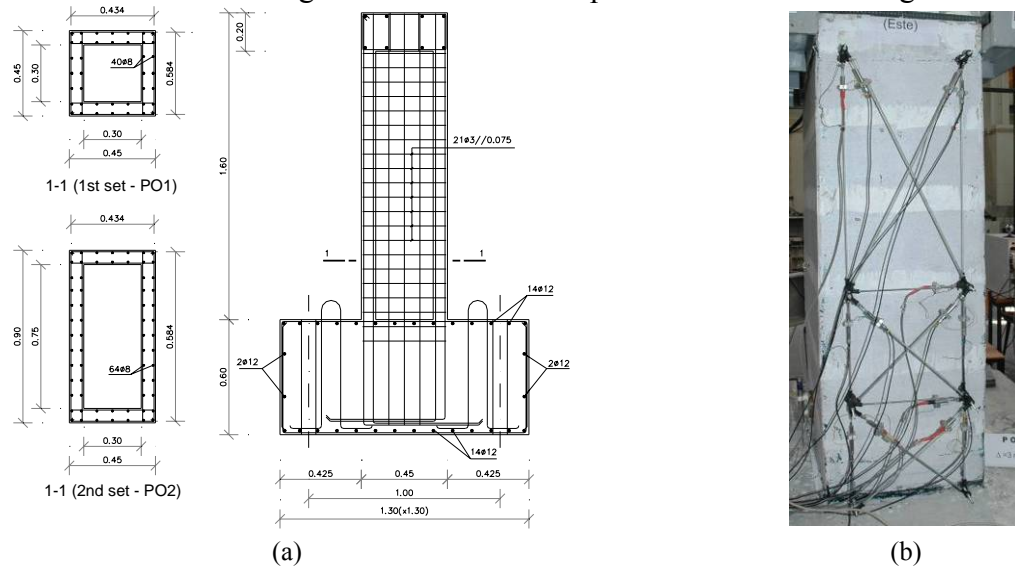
Hollow RC piers: a) model schemes and b) lateral LVDT layout.
